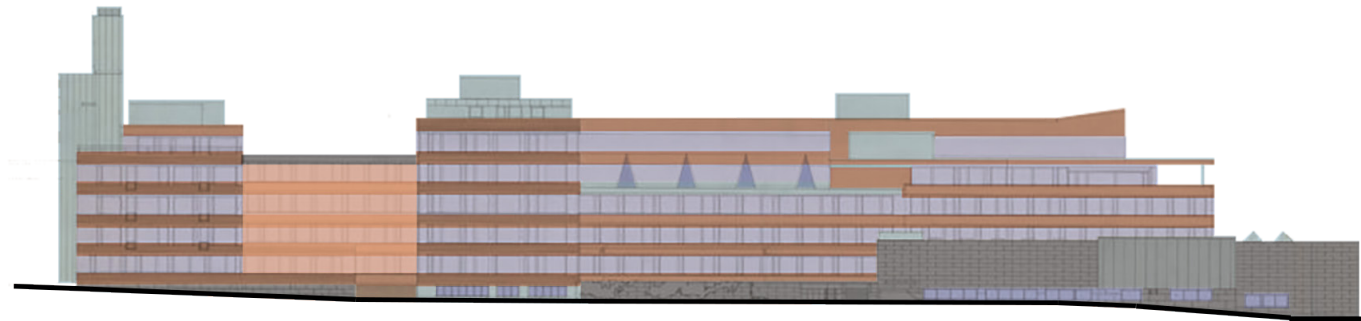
Elevation to the southwest (Alvar Aalto Foundation 1955), altered by authors.
